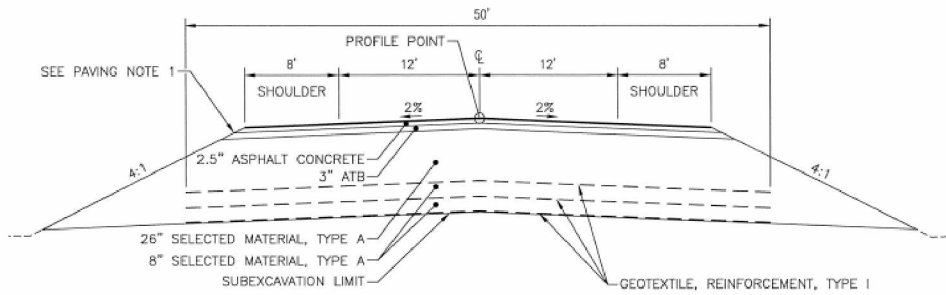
Healy, pavement structure V (image courtesy ADOT&PF)
